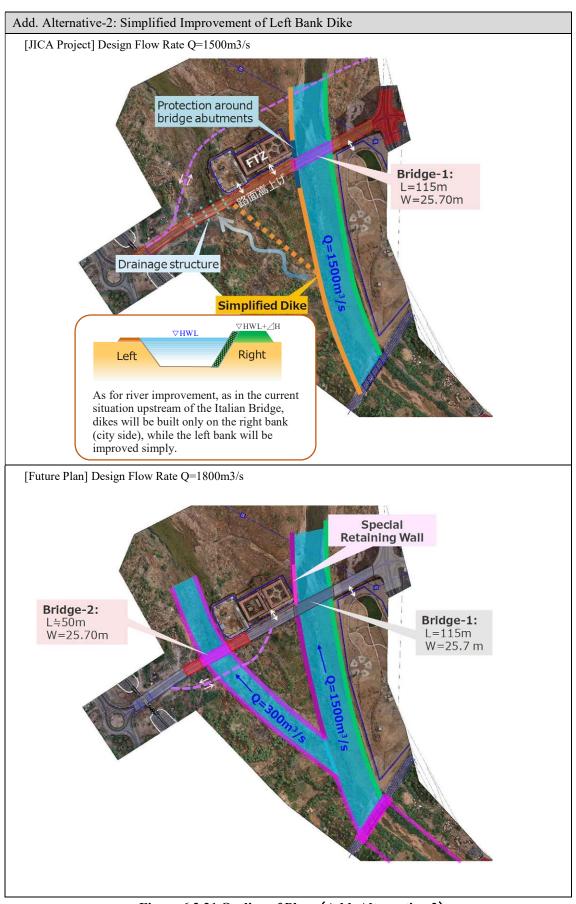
Outline of Plan (Add. Alternative-2)
